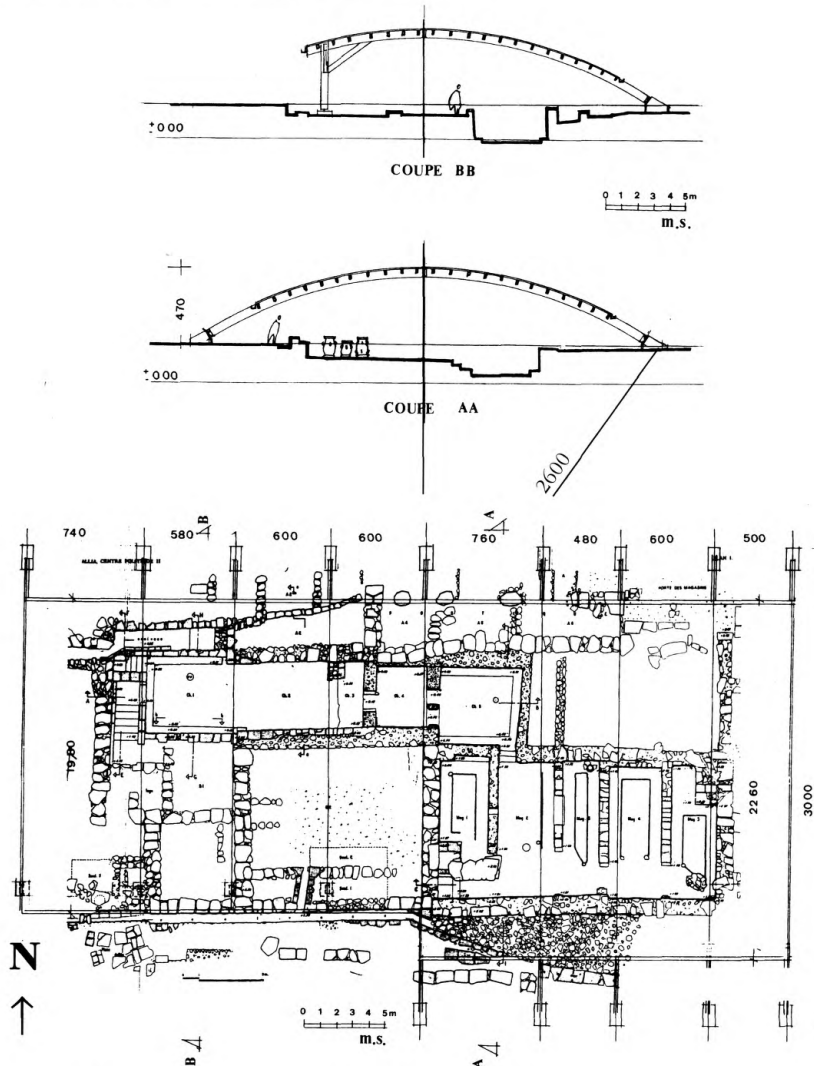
Mallia: sections (above) and plan (below) of the shelter covering the crypt.
